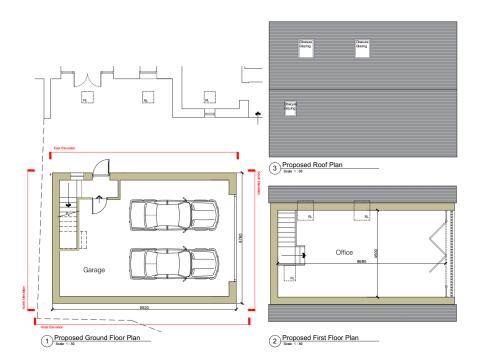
Drawing Ref no. P.03-ZZ-002 - layout of proposed development
